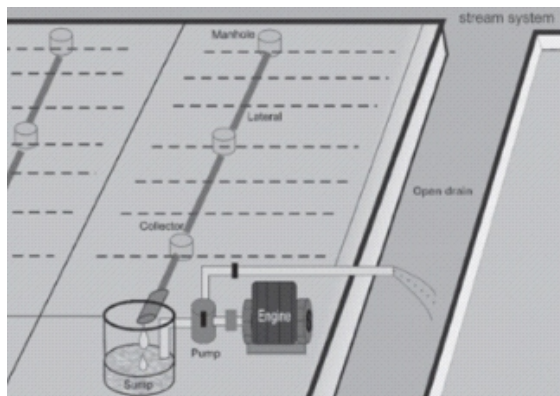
Schematic layout of Subsurface Drainage system in the Laboratory condition.
